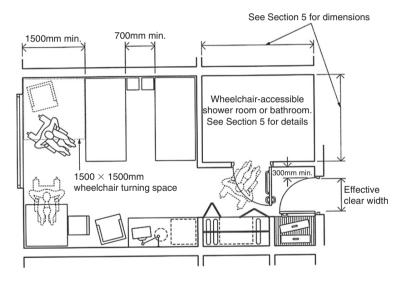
Example of a wheelchair accessible hotel bedroom
